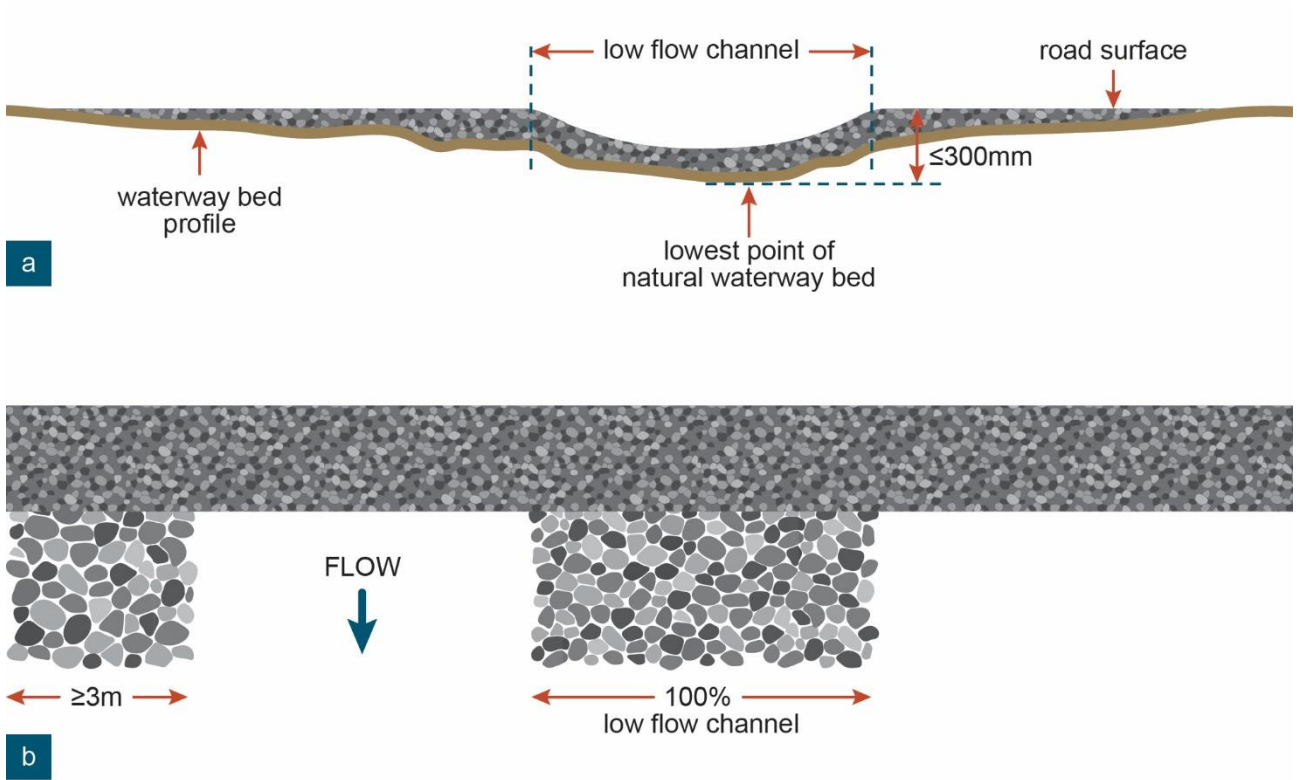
Low level crossing option 2, incorporating low flow channel – amber waterway (a) cross-section of waterway (b) plan view
